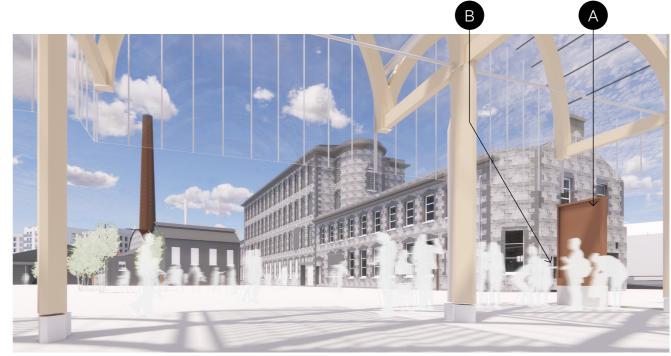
Sketch view under Riverside Canopy
